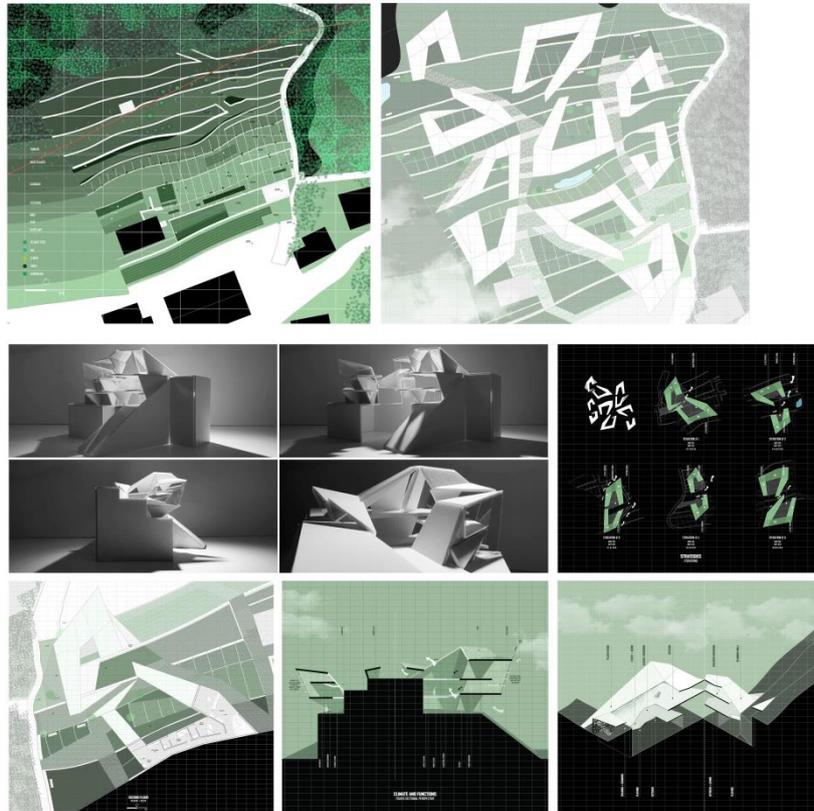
Hybrid architecture and existing landscape terracing. Lea Tabaja.
